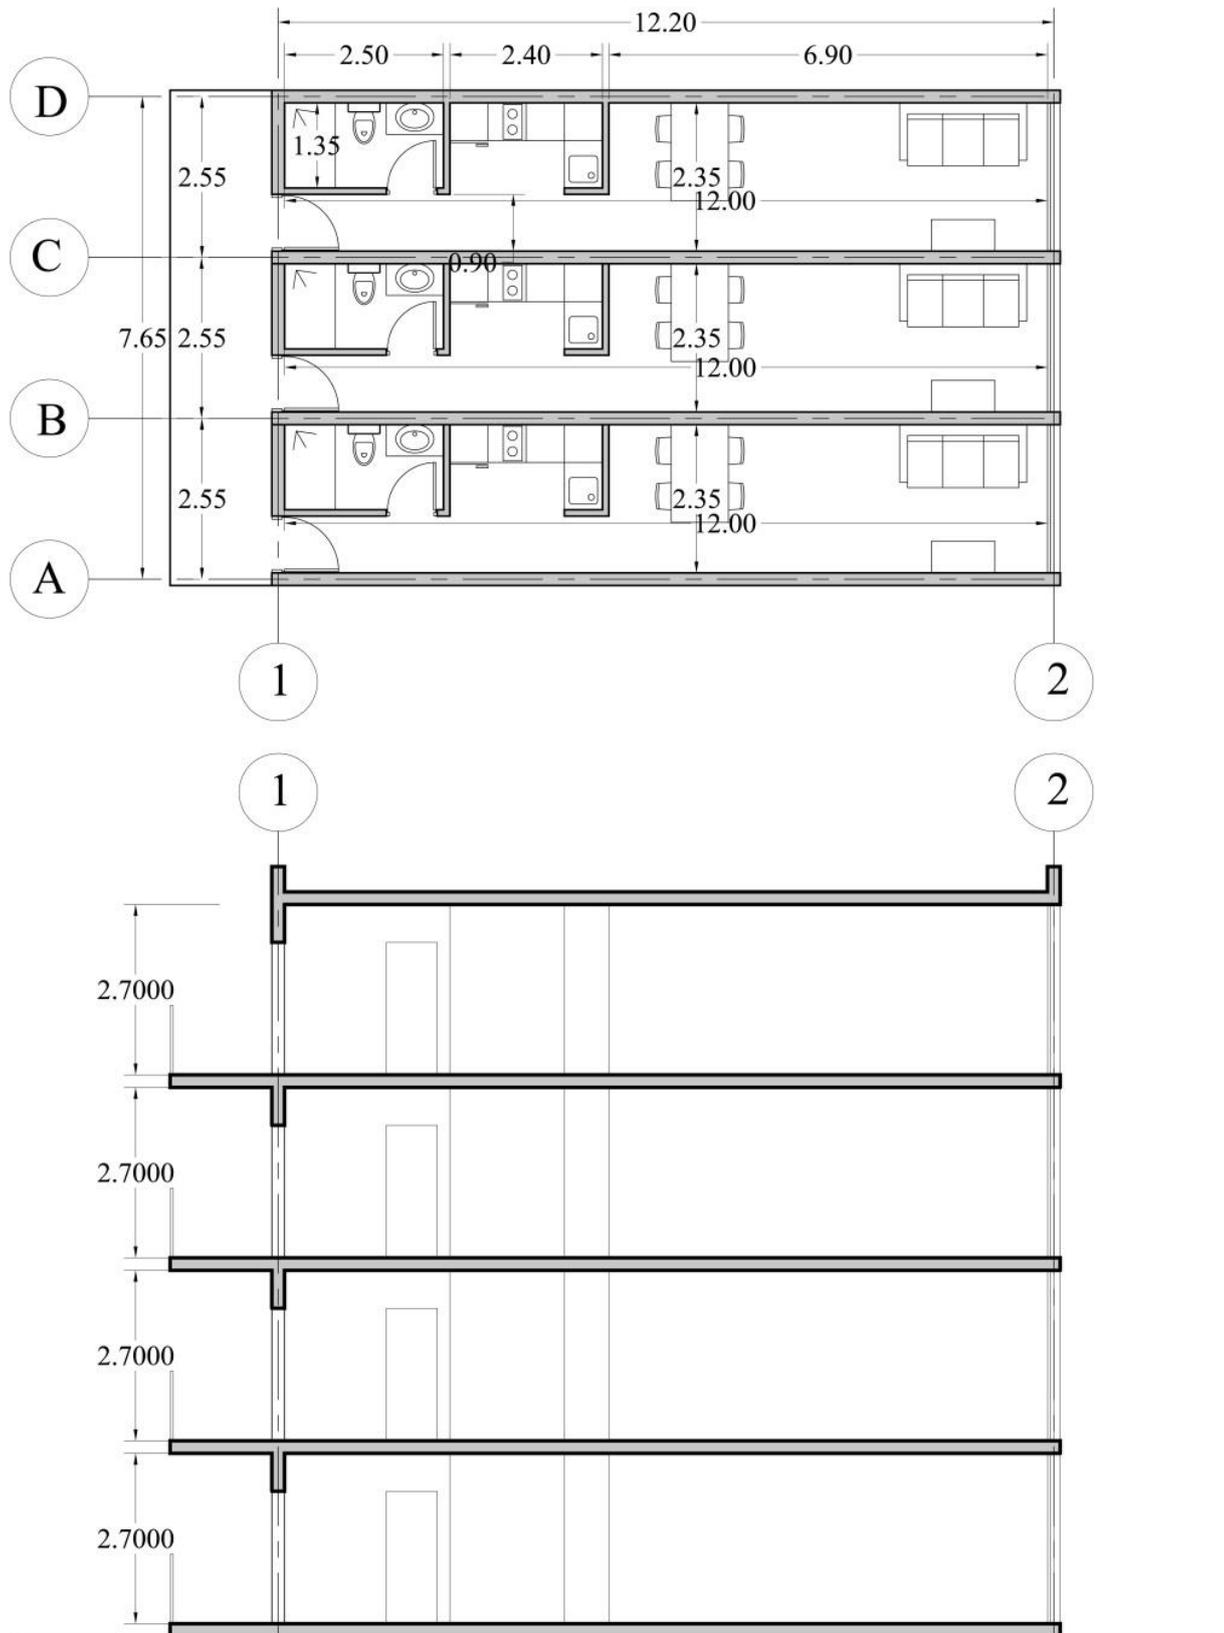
Typical Floor Plan and Cross Section for the Proposed Building
